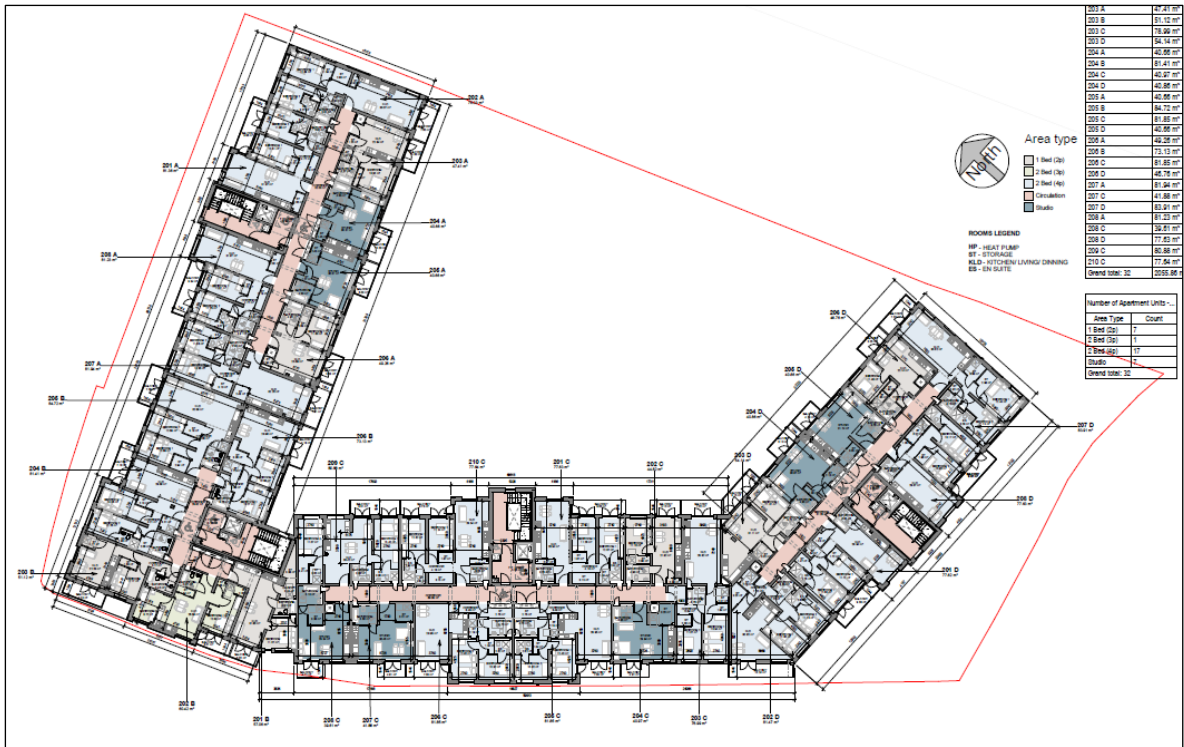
Second floor plan of proposed amended development under ABP Ref. ABP-307177-20
